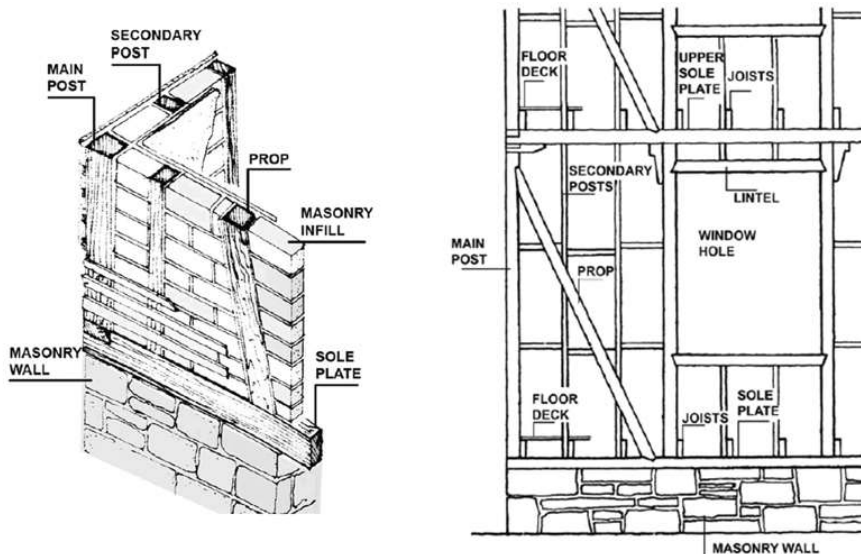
Structural order of timber framed buildings (Bal, Engin, Vatan, Meltem)
